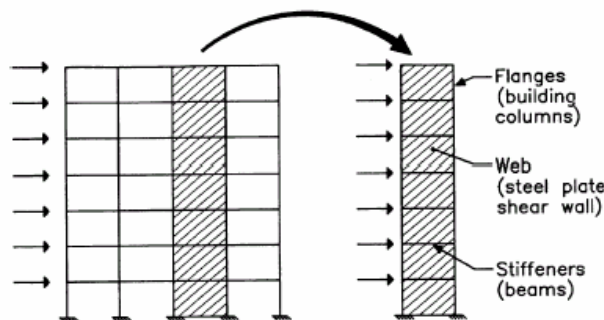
Steel shear walls and plate girder analogy (after Bruneau and Bhagwagar, 2002).
